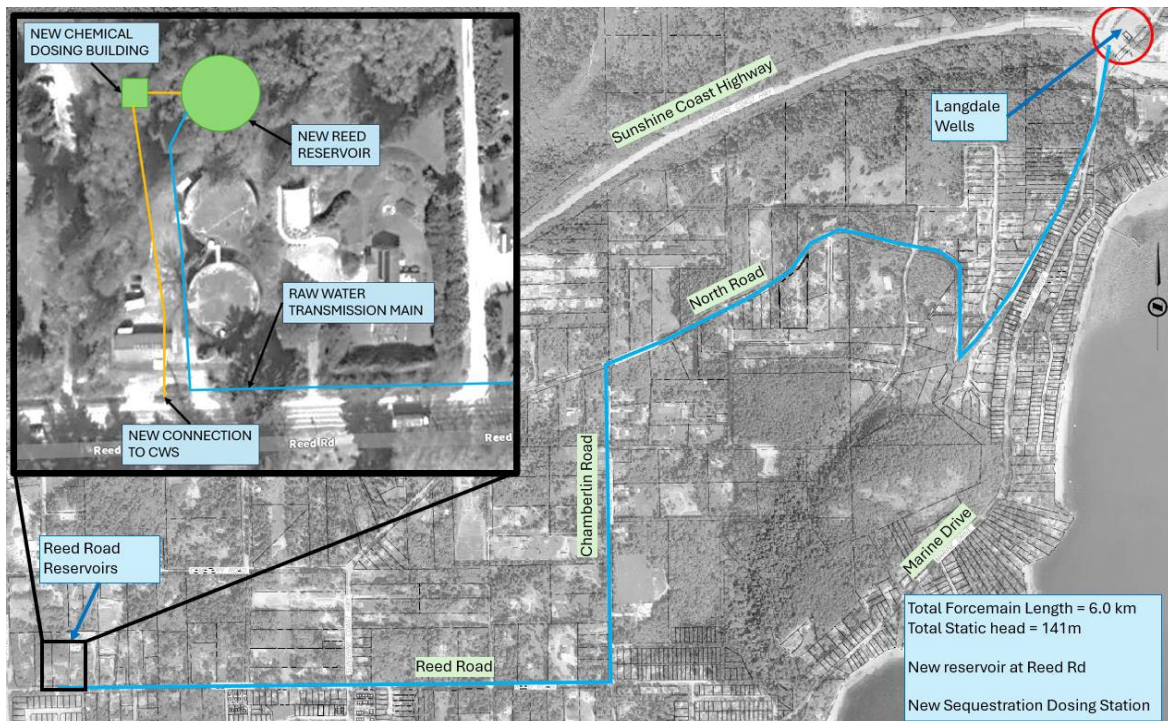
Alternative 4 – S-1 Langdale to Reed Road via North and Chamberlin Roads
